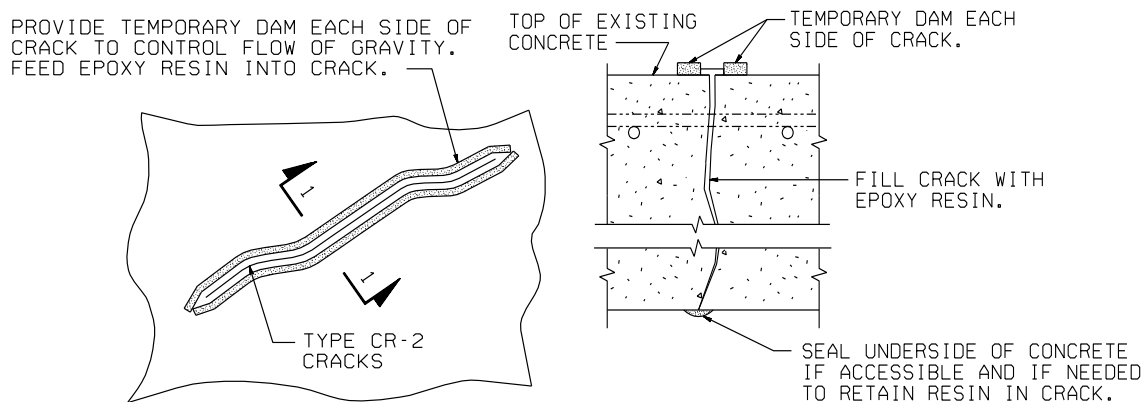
Section 1-1 – horizontal surface crack repair detail (for cracks 0.8 mm (1/32”) wide and greater) (FHWA, 2005).
